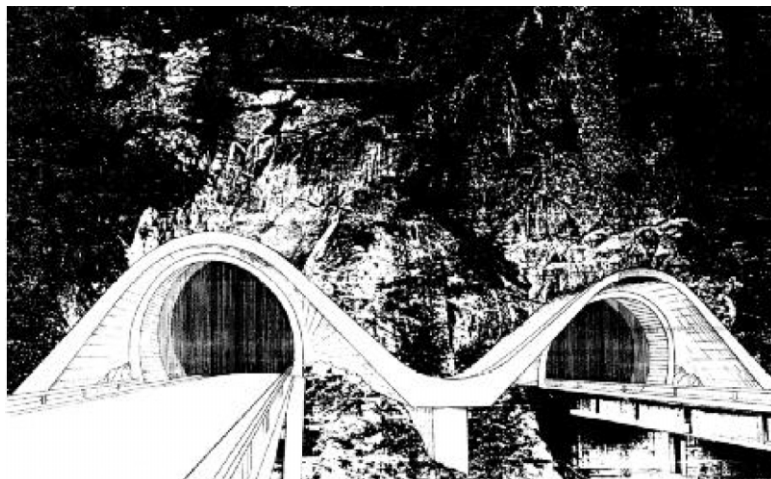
Example of an artificial concrete tunnel to protect against rock-fall.
